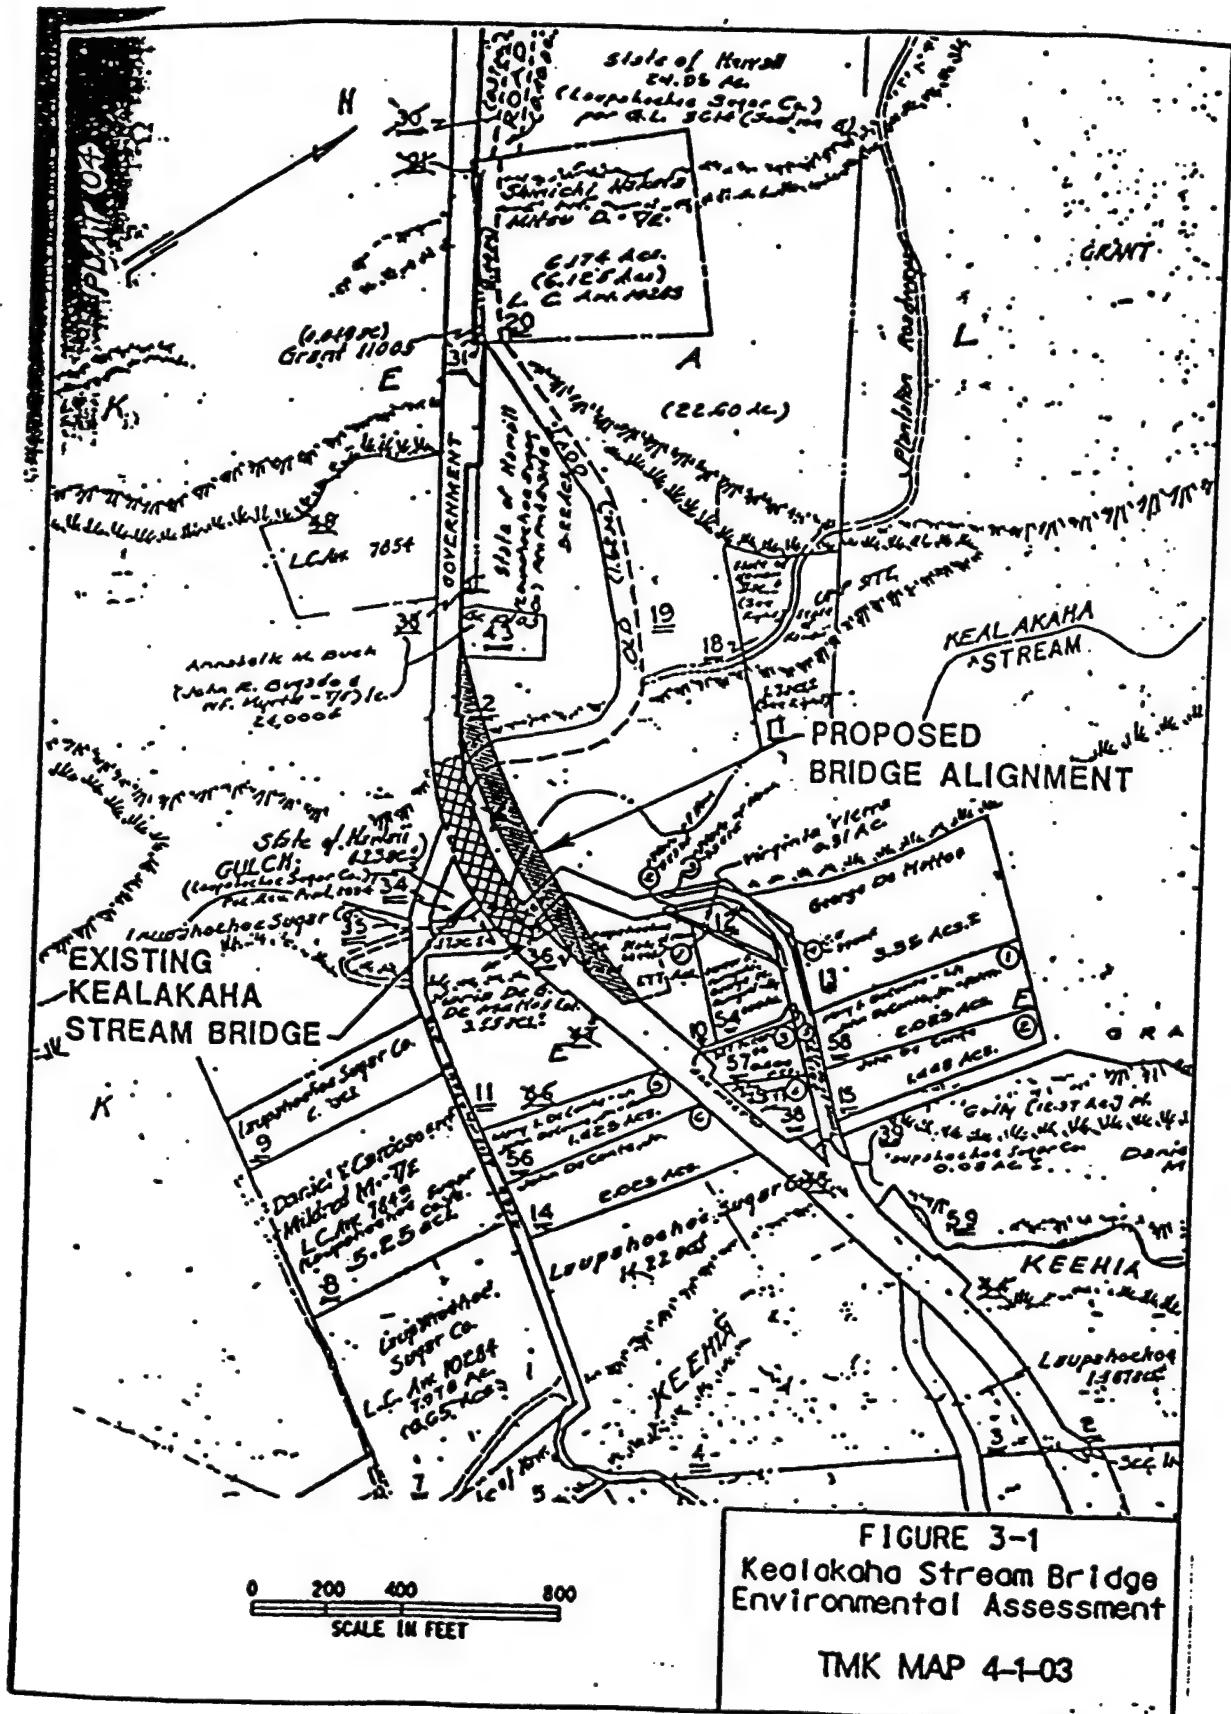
Proposed Kealakaha Stream Bridge Alignment (From: HDOT, 1995).
